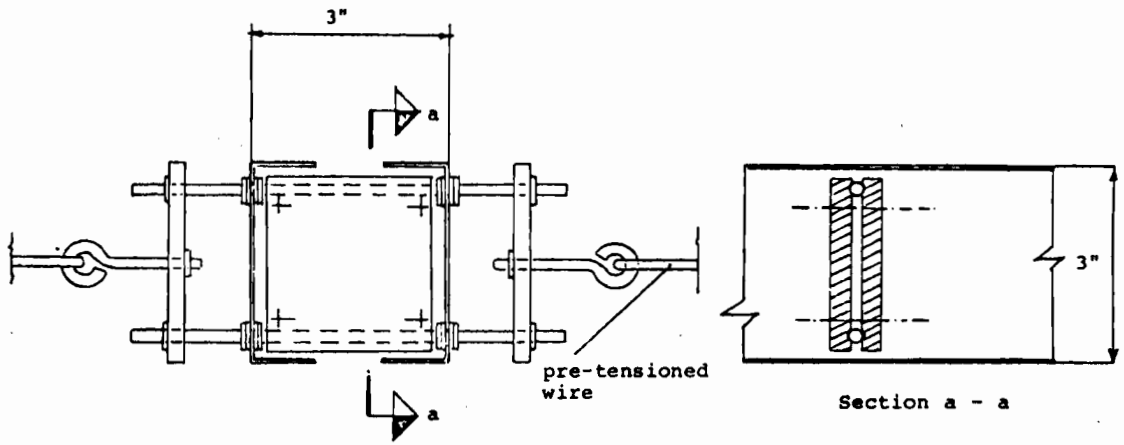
Detail of discrete Bracing at Mid-Span for Test 7 and 8.
